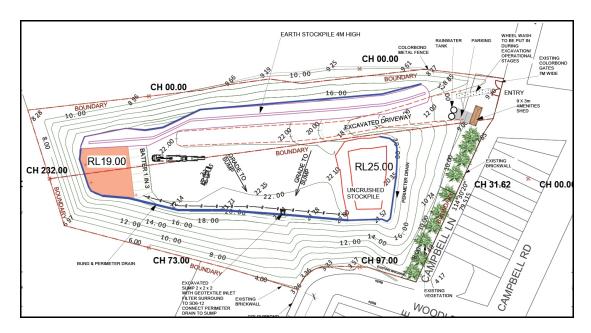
Extract from the initial Stage 1 plan. Full details are provided on Drawing No.09, Issue E of the plans of the proposed development at Appendix 9.
